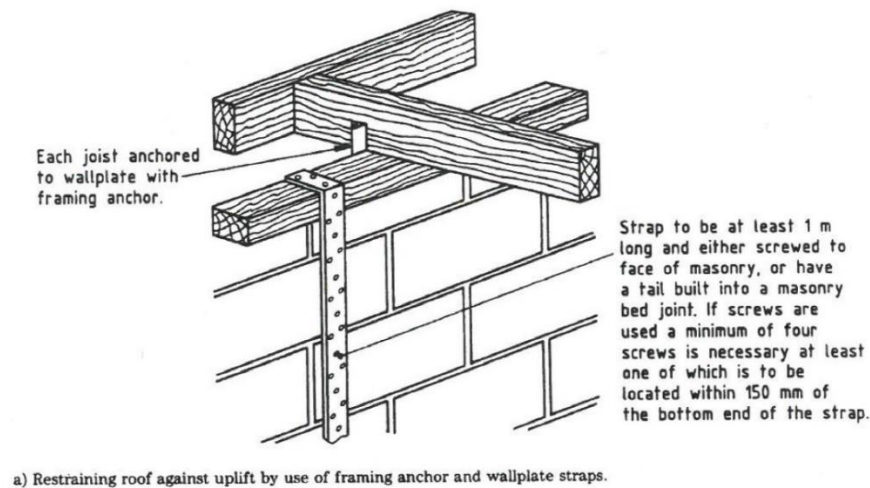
a. Wall plate strap detail taken from BS 8103 – Code of Practice for Low Rise Buildings.
